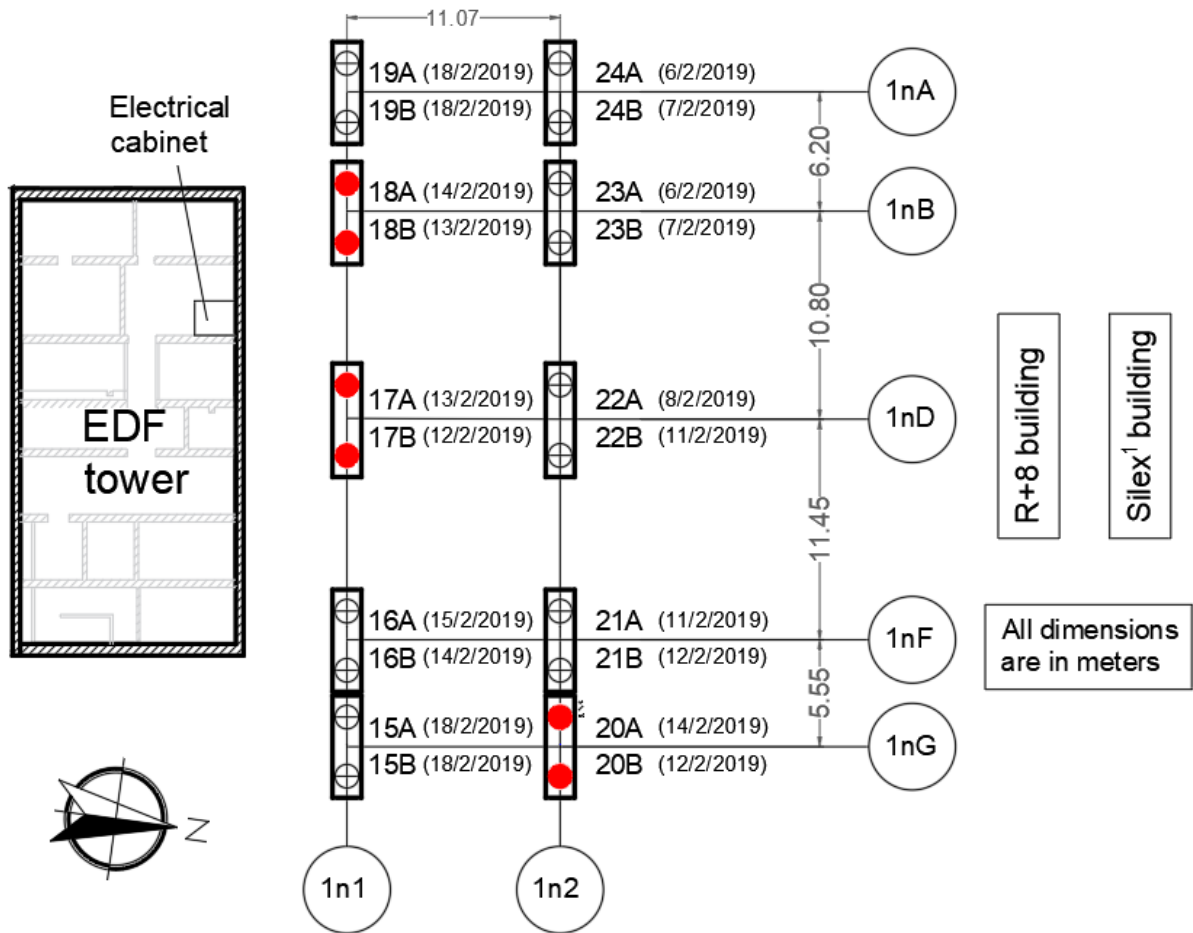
Foundation plan in Silex<sup>2</sup>
